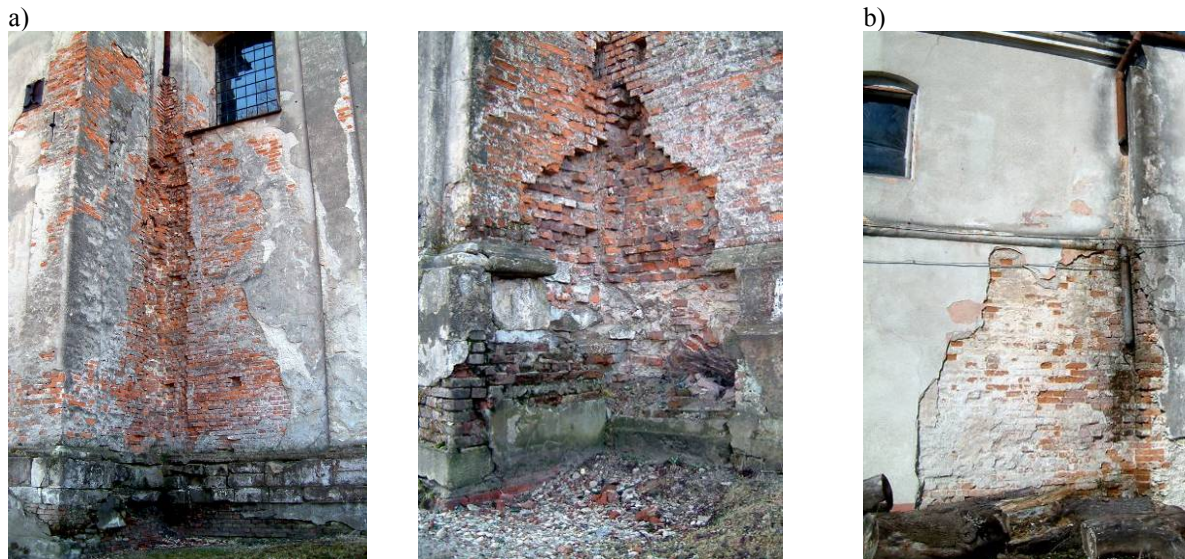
Damages of walls caused by rebuilding, dismantling and war activities:
